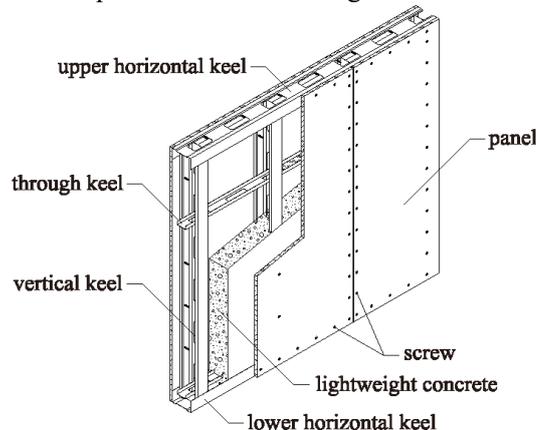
Structure of lightweight steel gauge and lightweight concrete partition wall
